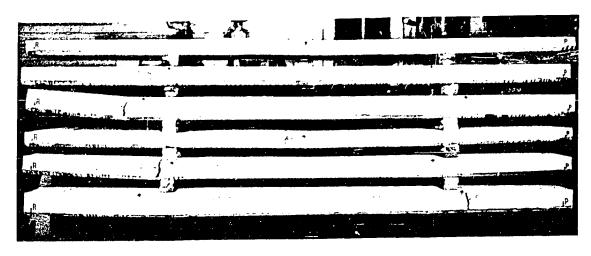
Typical shear-bond failures of beams constructed with deck G-20 and 24 gage. Each beam was approximately 28 inches wide and 12 feet in length with variable depths
